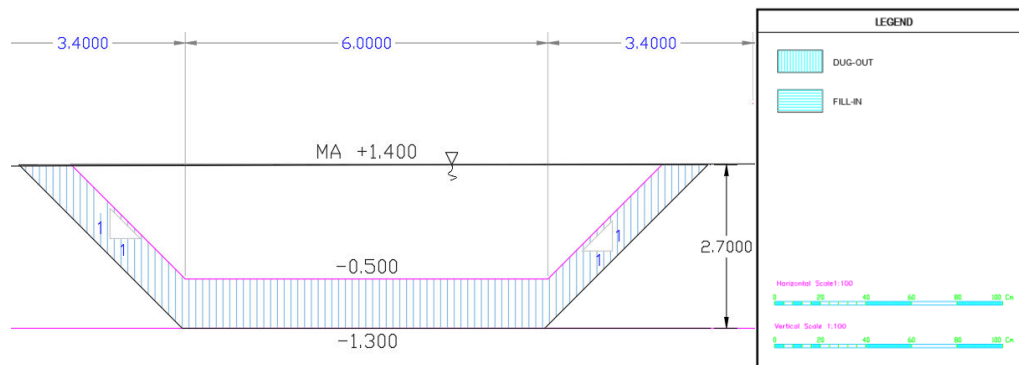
Normalization plan for 3<sup>rd</sup> drainage segment
